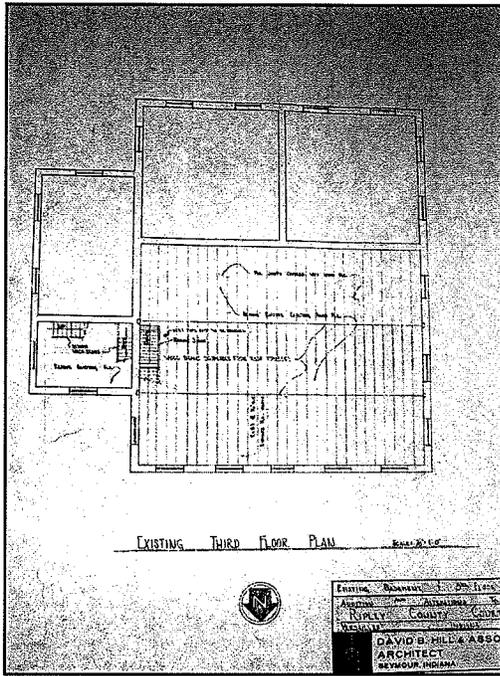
Photograph of Existing Third Floor Plan from 1971-72 drawings. Note: The floor shown is above the 25' court room ceiling and represents attic storage. Evidently stairs in the room behind the court room led to this storage space. It was removed in the renovation to allow more head room for the new third floor court room and offices.
